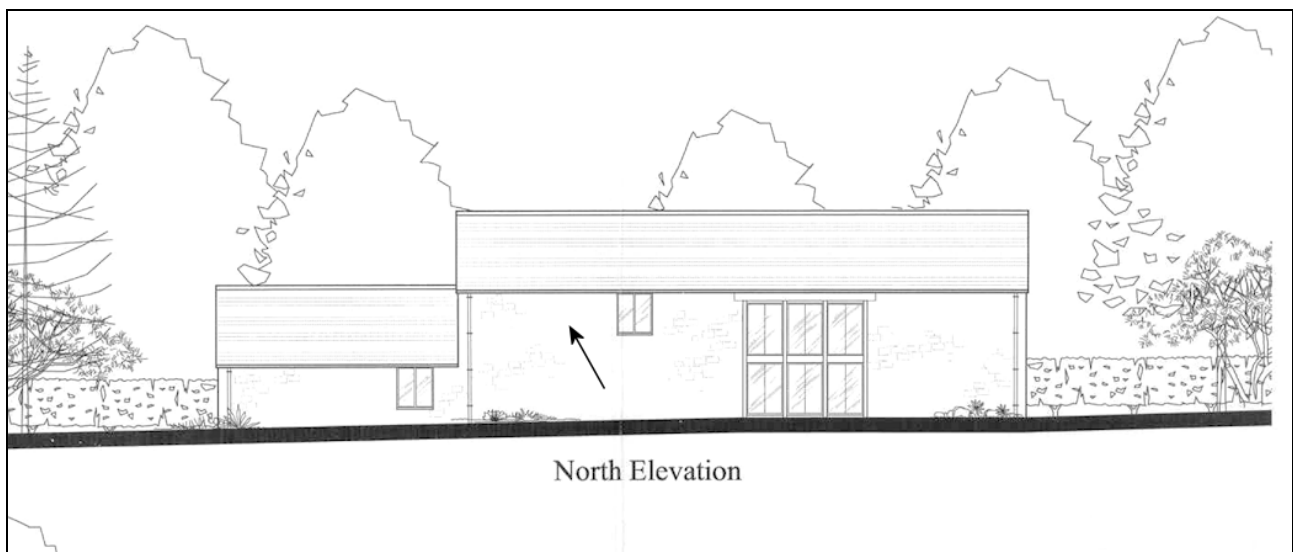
Proposed north elevation showing the location of the crevice in the stone wall of the converted barn (from Stable Architecture Drawing No: 5353-03).
